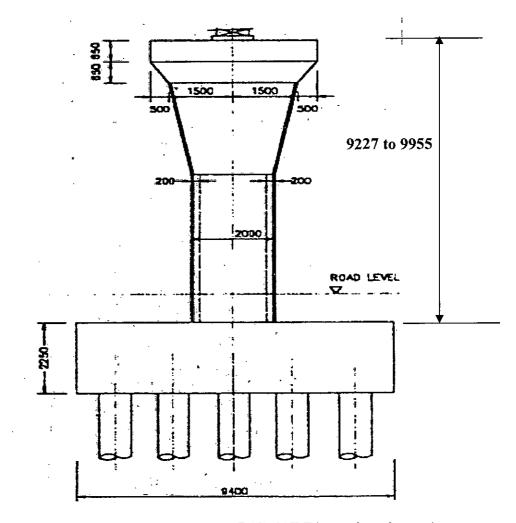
Elevation at Pier (P9, P10 and P13) (All Dimensions in mm)
